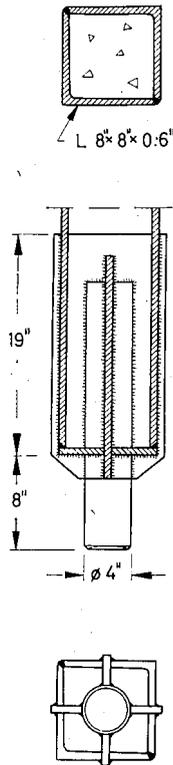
BOX PILE USED UNDER DIFFICULT FOUNDATION CONDITIONS.
